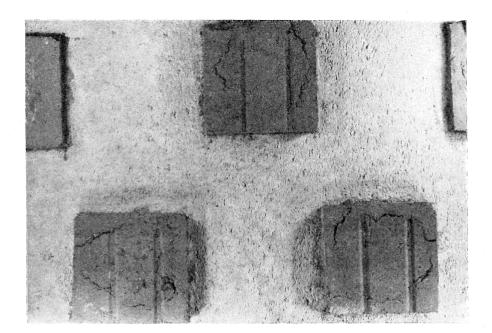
Cracks in cement mortar 1:3 applied between dry aerated concrete and dry glazed whiteware wall tiles.
